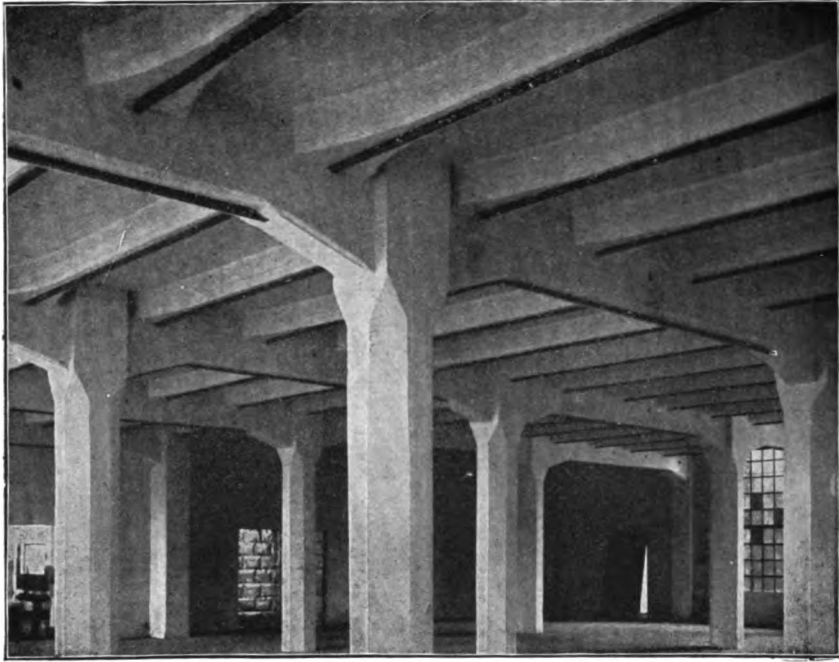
View of a floor in the Singer Manufacturing Co. factory showing widening of the beams where they intersect the girders. Columns of béton fretté.
